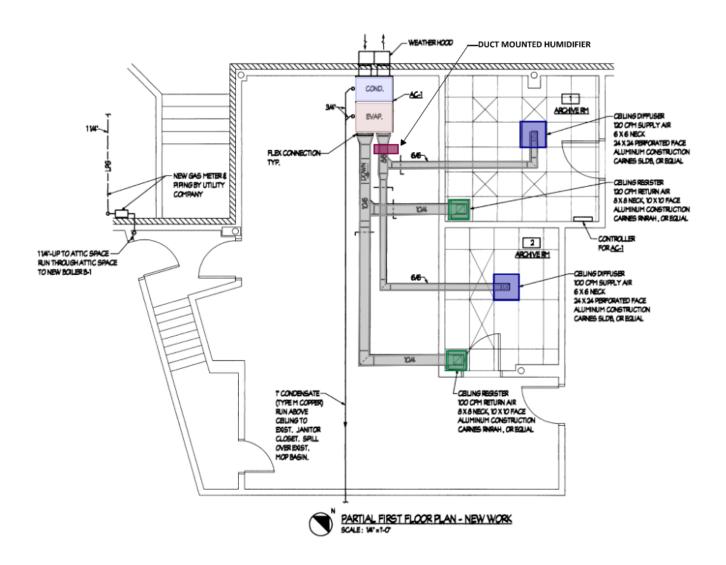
First Floor HVAC Equipment Locations - Archive Room HVAC Unit
